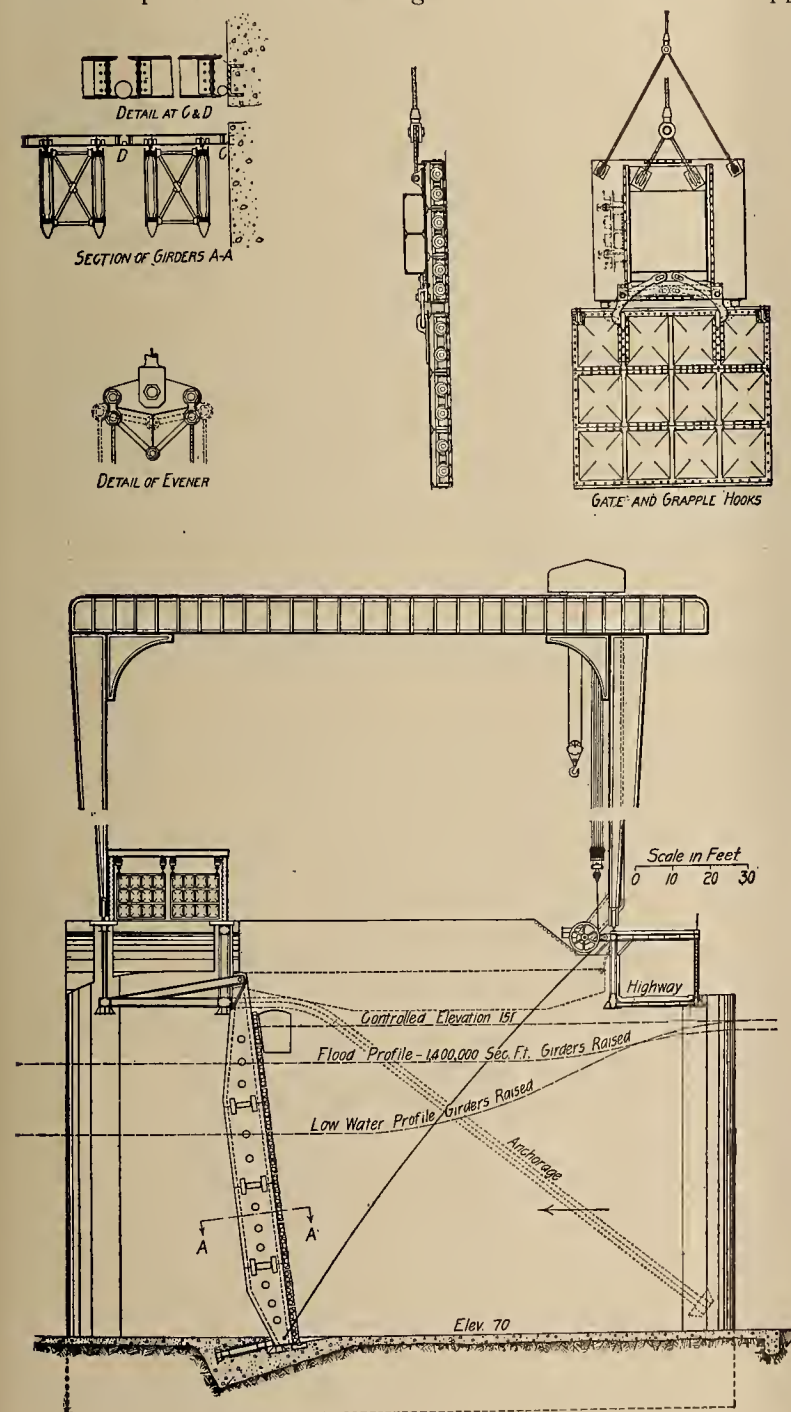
Camere or Vertical Girder Type of Removable Dam.
